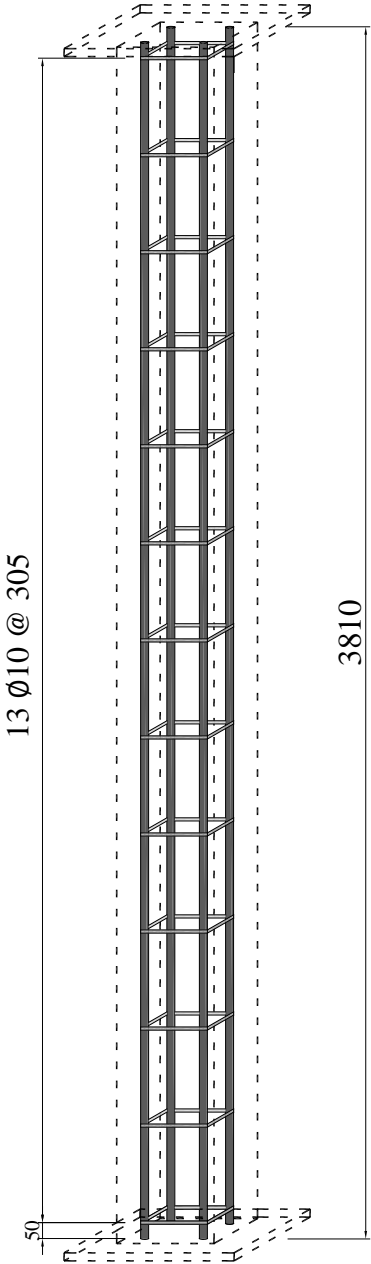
Reinforcement of a typical NRC column specimen in an isometric view (dimensions in mm)
